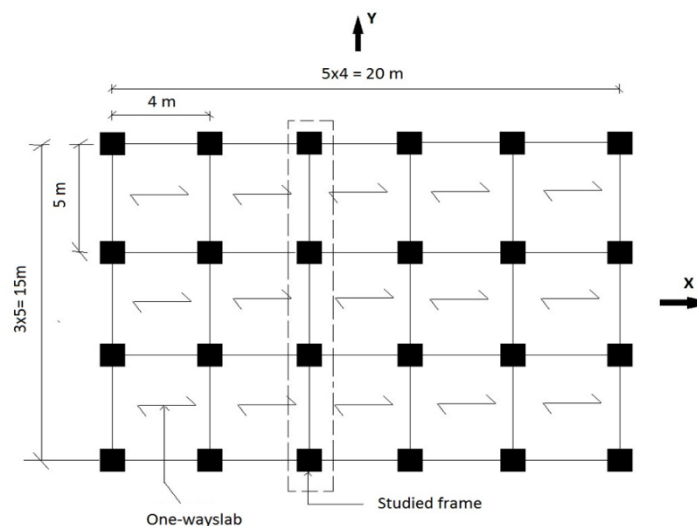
Typical floor plan for model buildings of 3-, 6-, and 9-story
